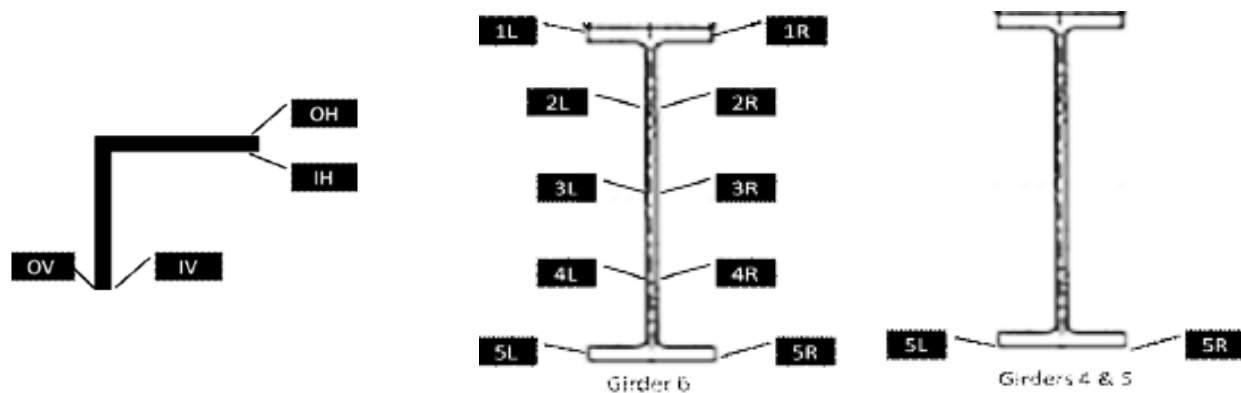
(a) Brace Angle and (b) Girder Gage Locations for 19th Street Westbound Bridge
